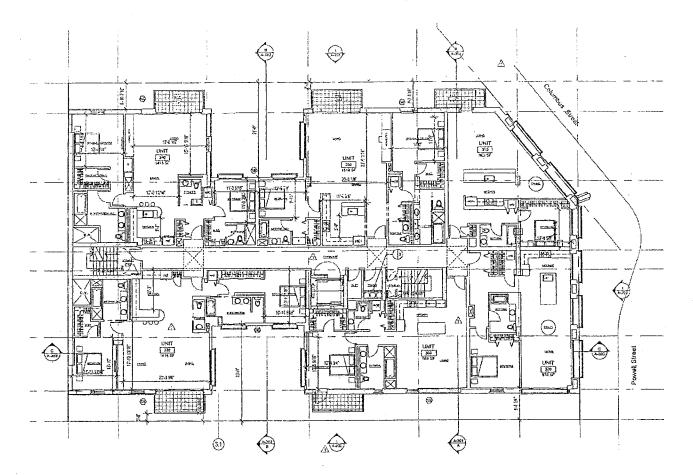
PROPOSED 1731 POWELL ST THIRD LEVEL PLAN Source: SWS 1/7/13
